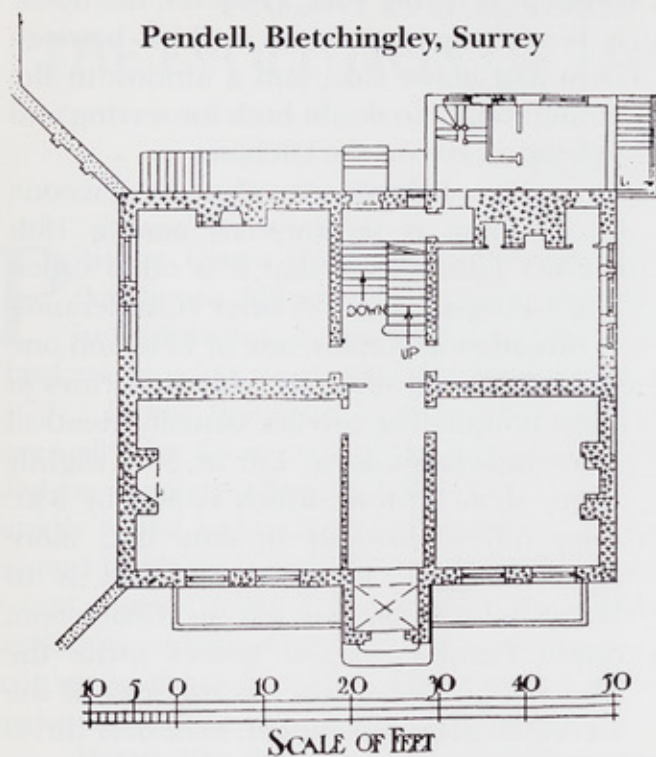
Houses with symmetrical elevations and direct entry halls:
